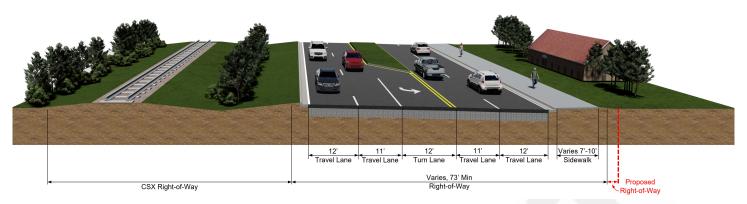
Design Concept Typical Section (US 17/Main Street from Airport Center Drive to Max Leggett Parkway)
